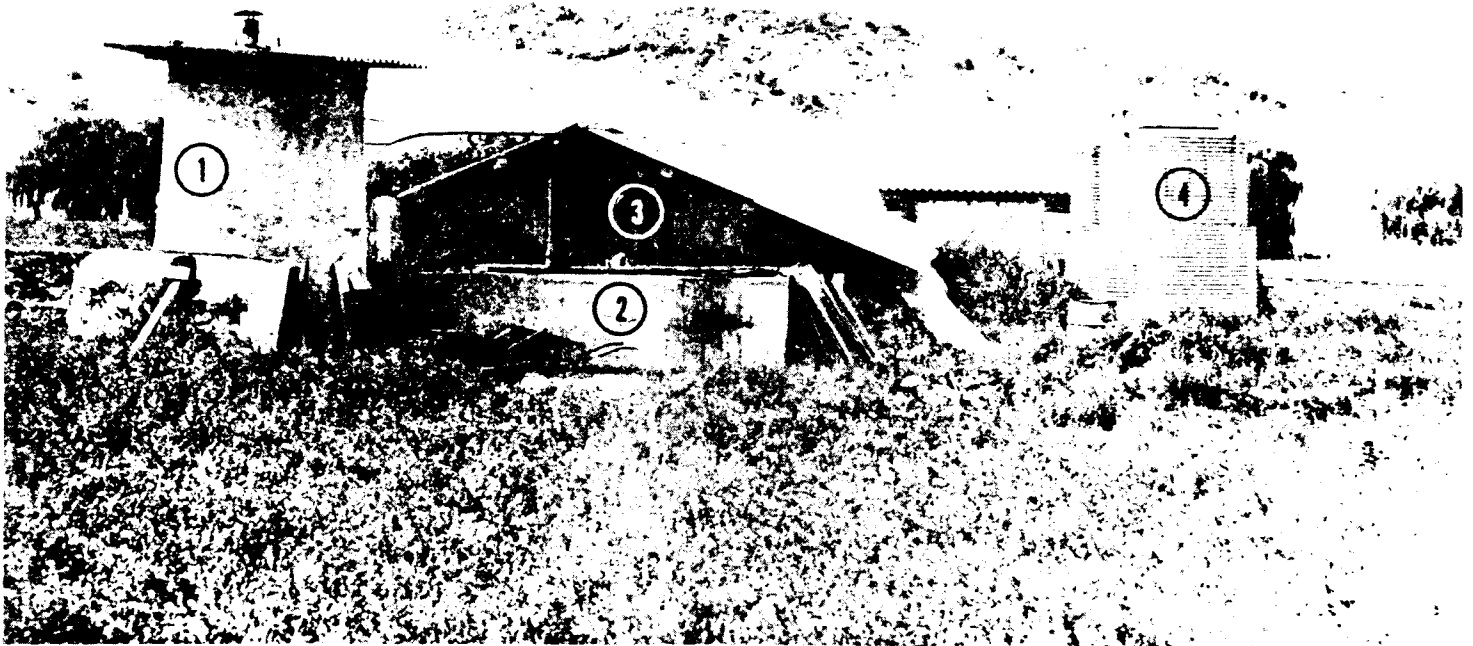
Displacement digester inlet end. 1) Hot water heating tower. 2) Mixing and loading basin. 3) Access door
